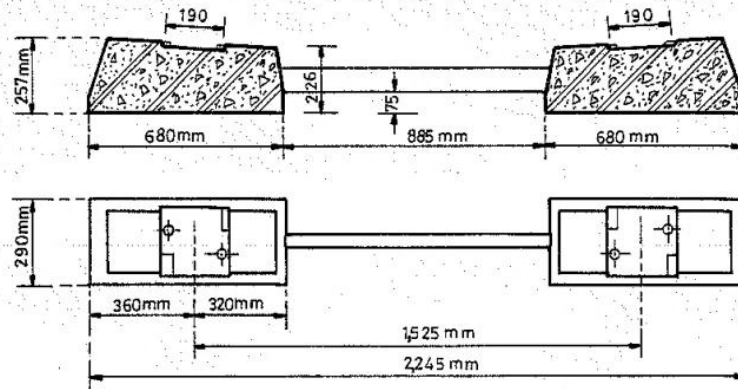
Twin-block reinforced concrete sleeper (Profillidis, 1995)
